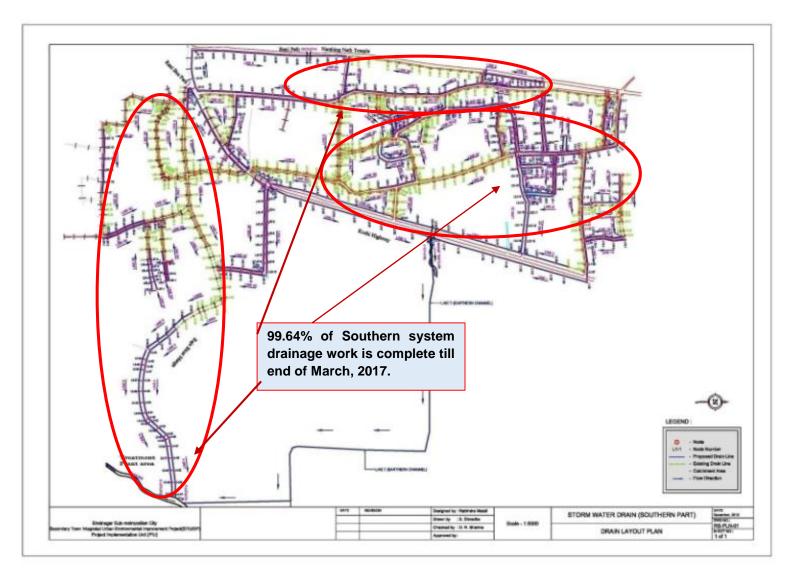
Proposed Storm Water Drains in BSMC (Southern Drainage System)
